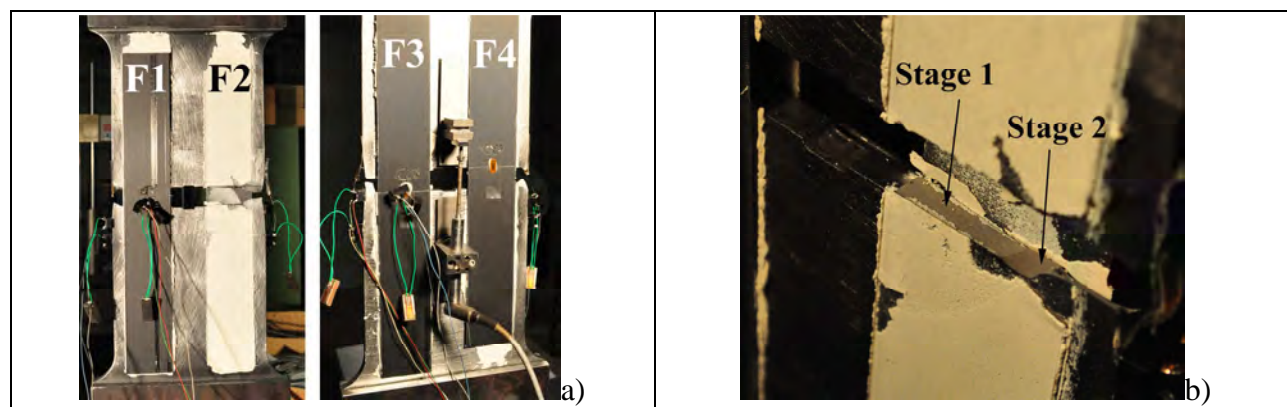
a) Debonding of CFRP laminates, b) Fracture of specimen
